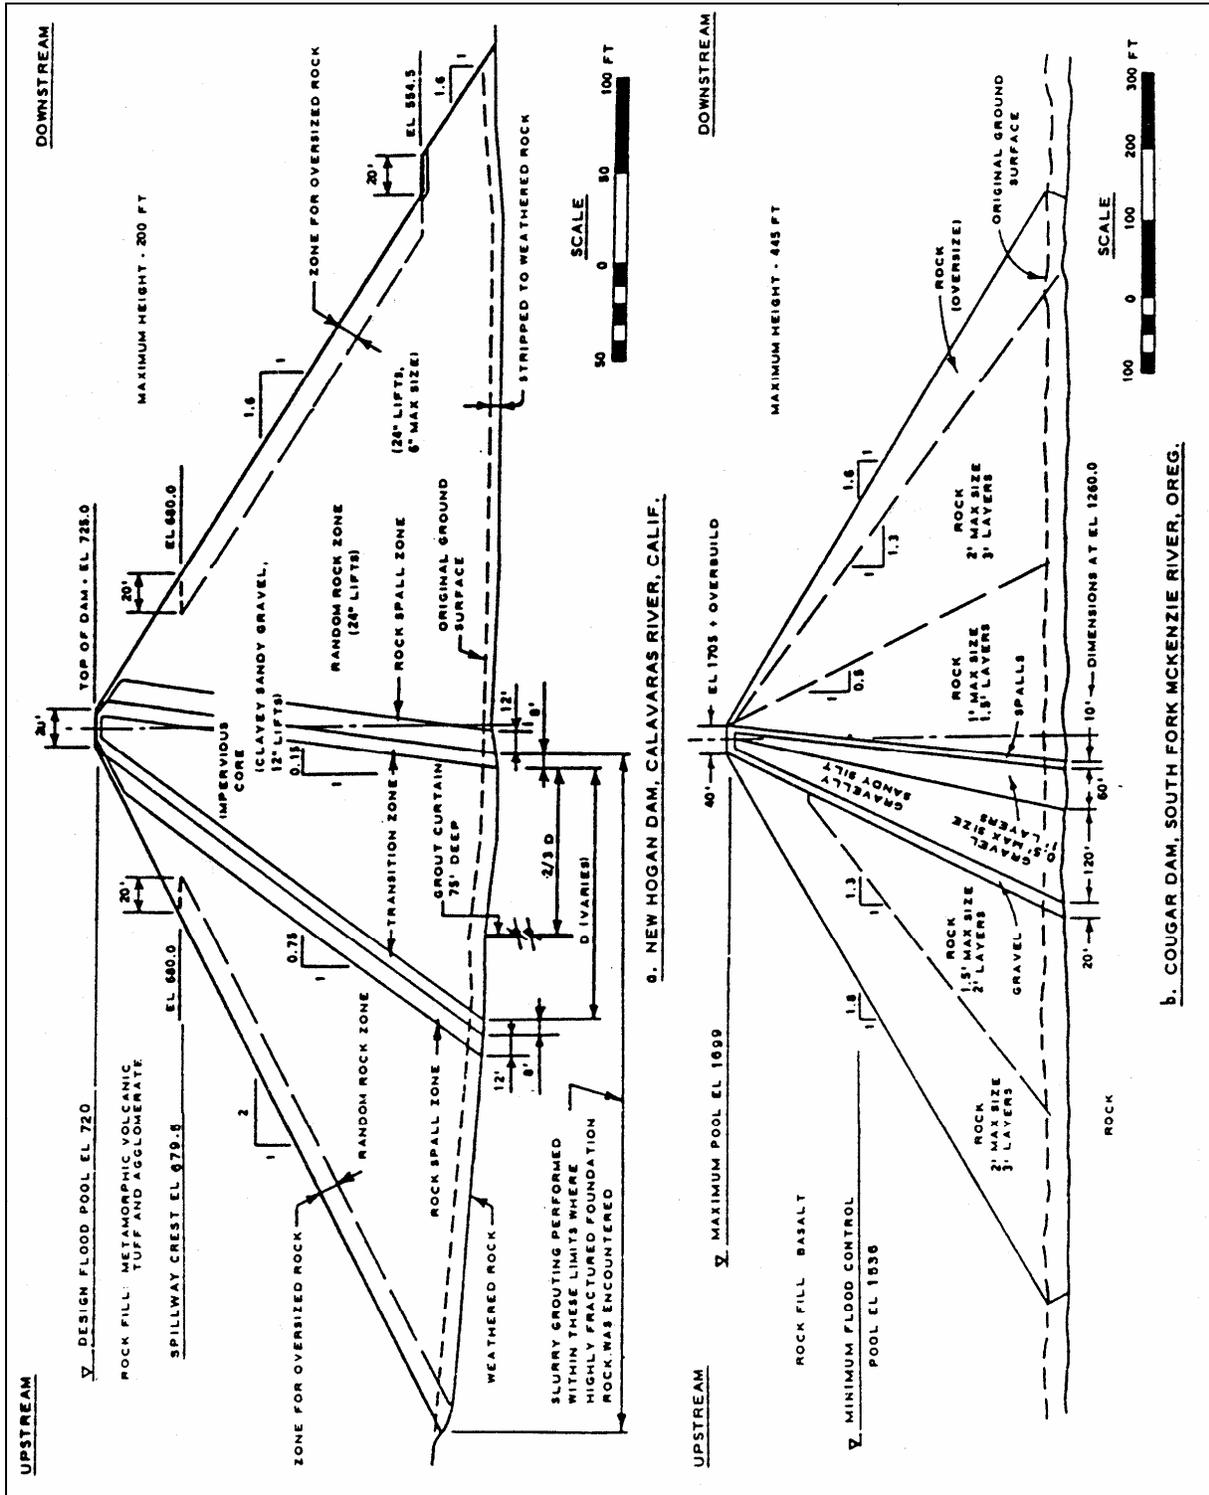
Embankment sections, rock-fill dams (New Hogan and Cougar Dams)
